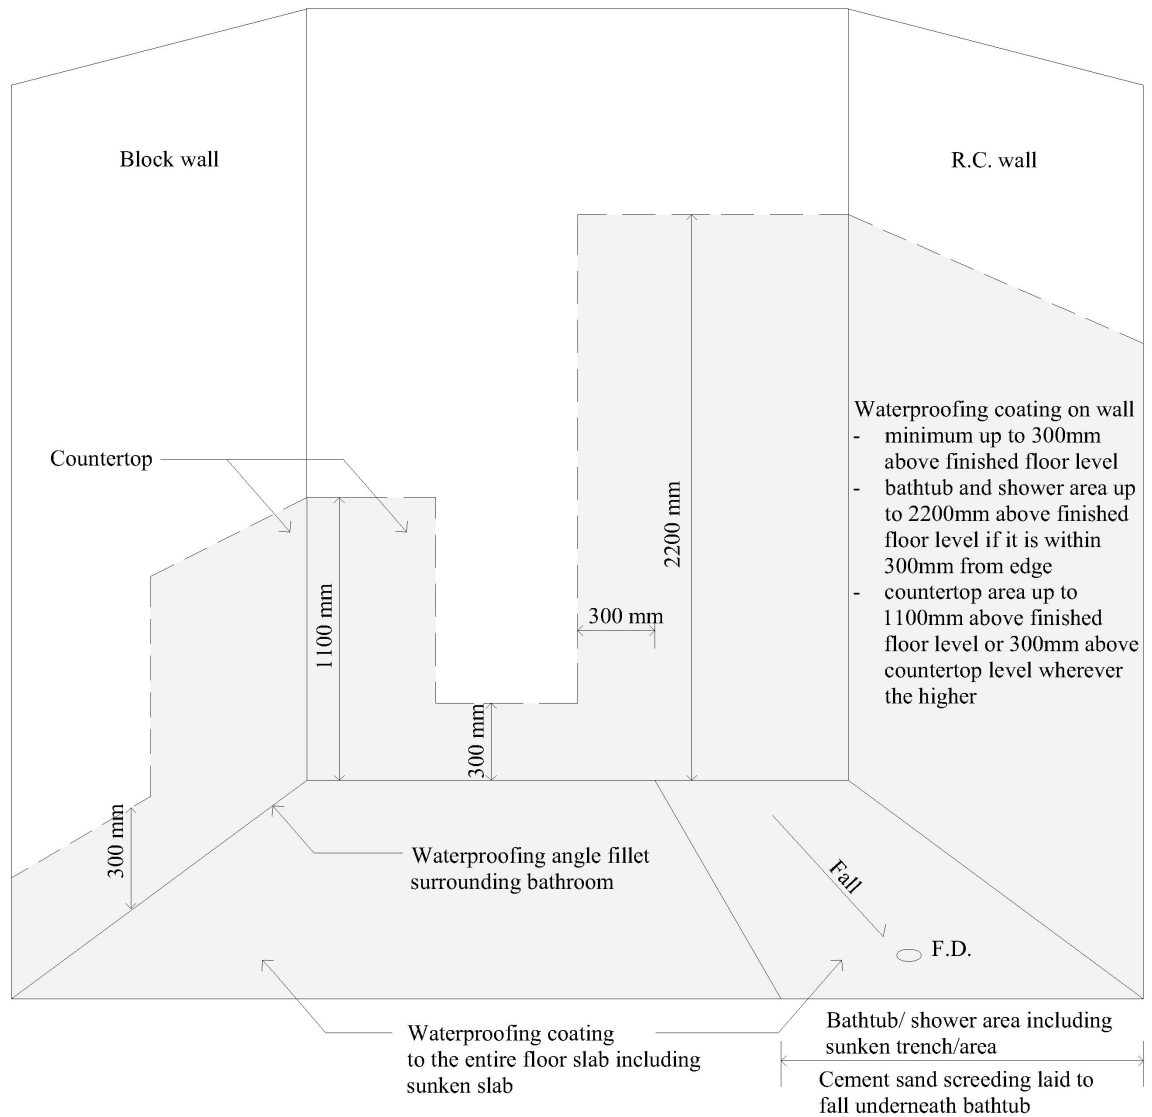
Extent of Waterproofing Works in the Bathroom and/or Toilet
